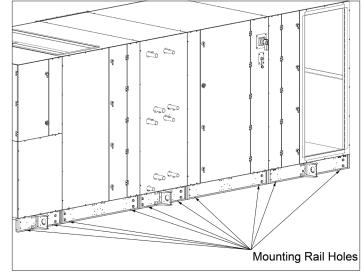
Mounting Rail Holes for Sizes 060-100 Units
